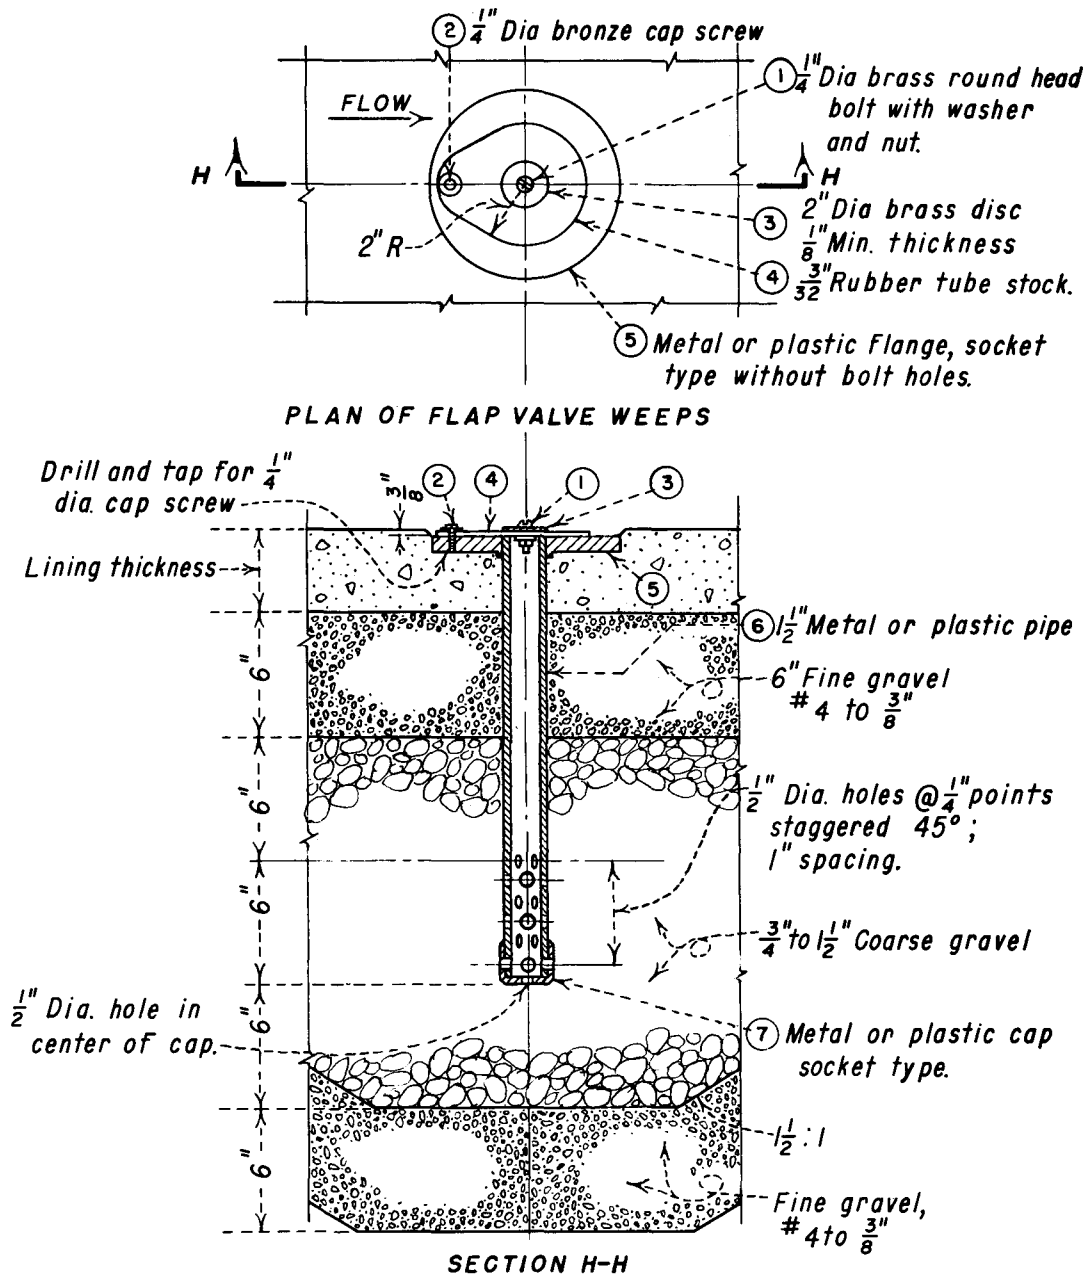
Flap valve installation for a canal underdrain. 103-D-636.
